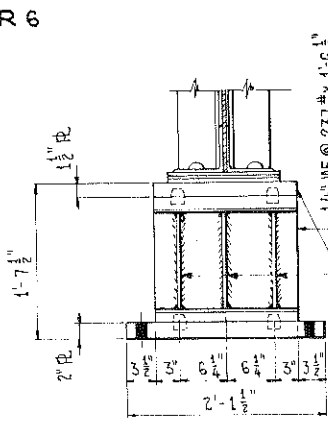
DETAILS OF ALTERNATE ROCKER BRG. AT PIERS 3,4,5,8
